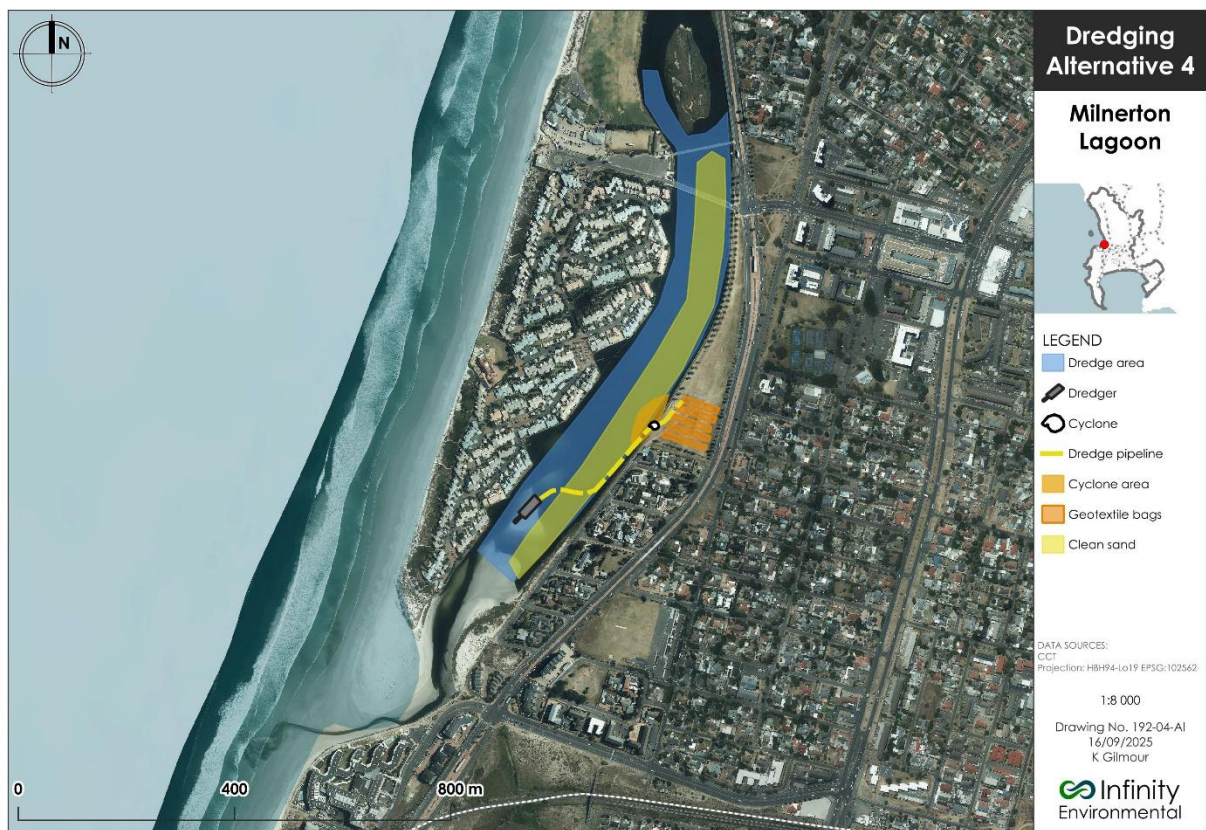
This schematic presents the design and layout Alternative 4 – the proposed ‘full’ dredging with separation of sand and fine sediments, off-site disposal of sediment.
